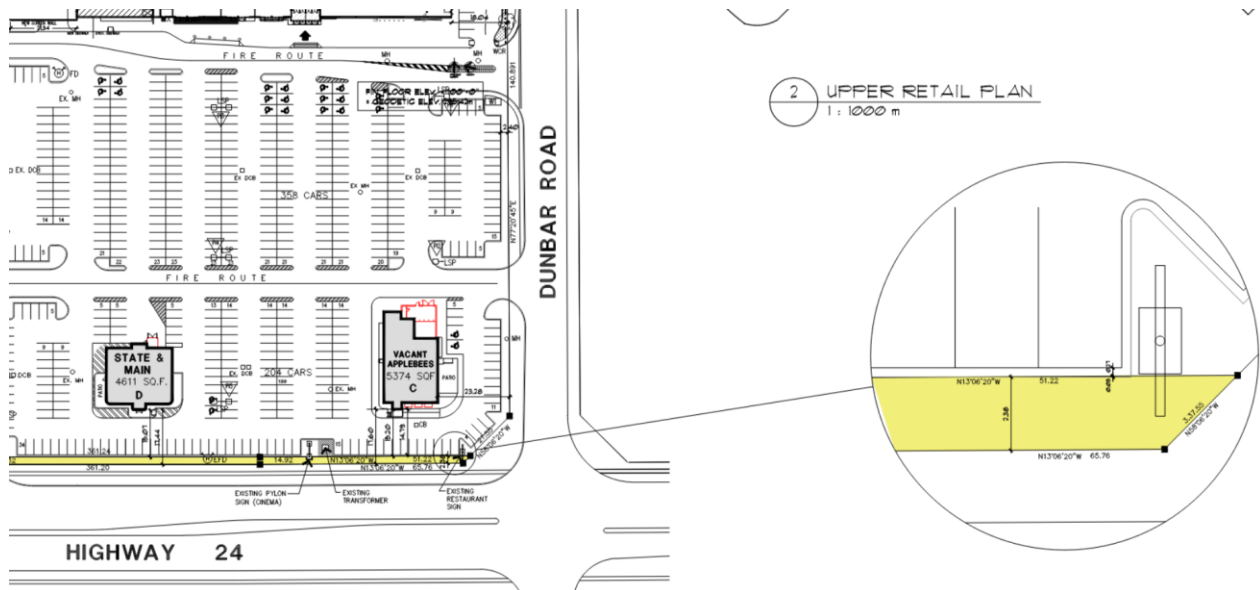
Proposed Road Widening along Hespeler Road (extends further than image illustrates)
